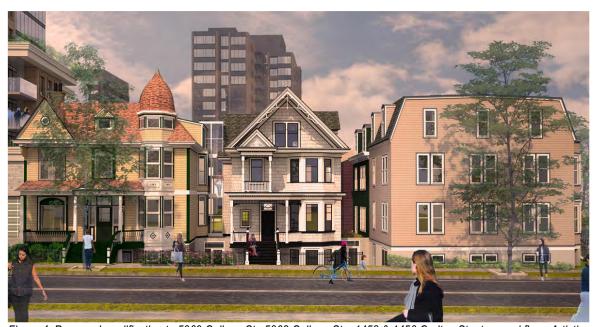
Proposed modification to 5969 College St., 5963 College St., 1452 & 1456 Carlton St. at ground floor, Artistic Render by Architect.
